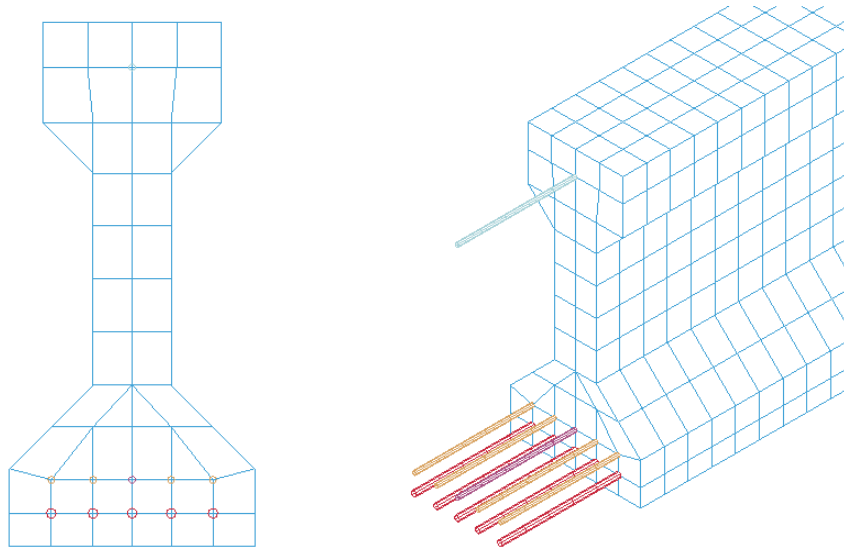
Zoom-In View of Strands at the Mid-Span of The Girder of Archetype 3 Bridge.
